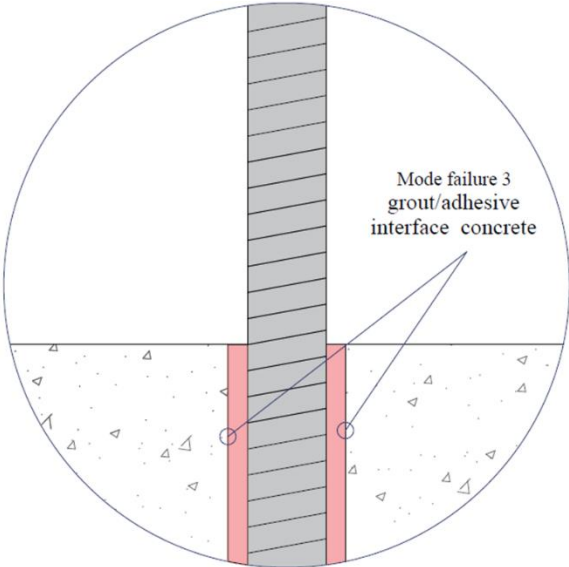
6 Mode failure III (between grout/adhesive interface with the concrete)
